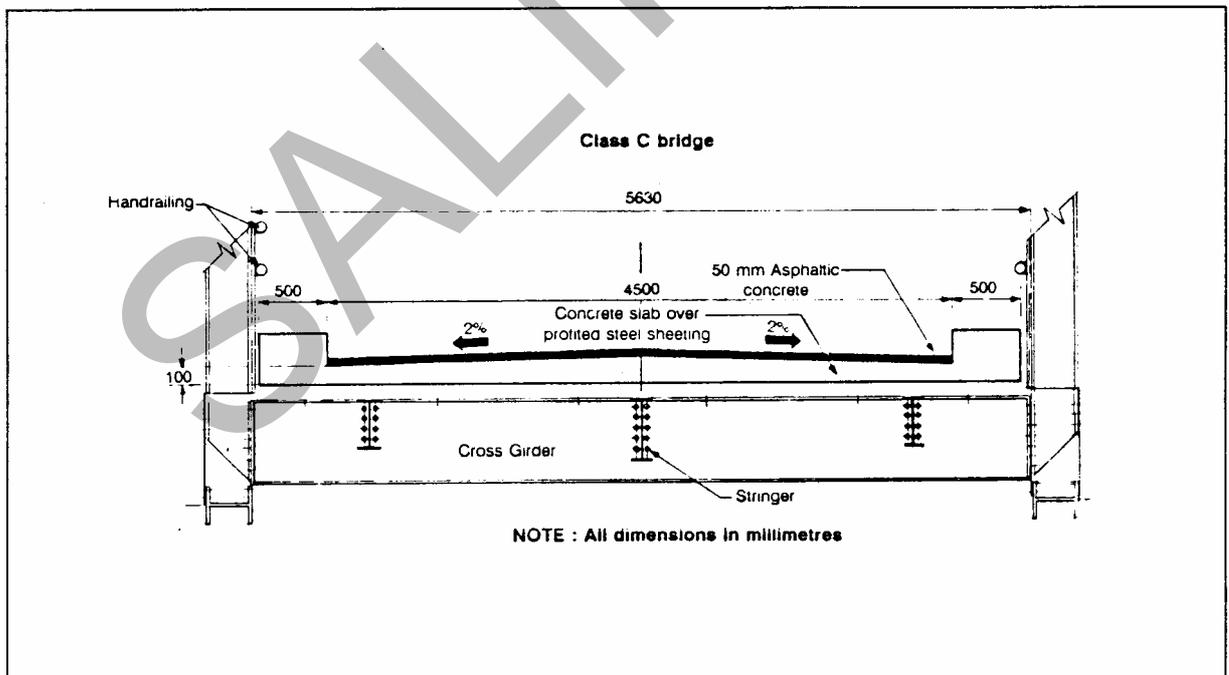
Austrian Permanent Truss - Concrete Deck
